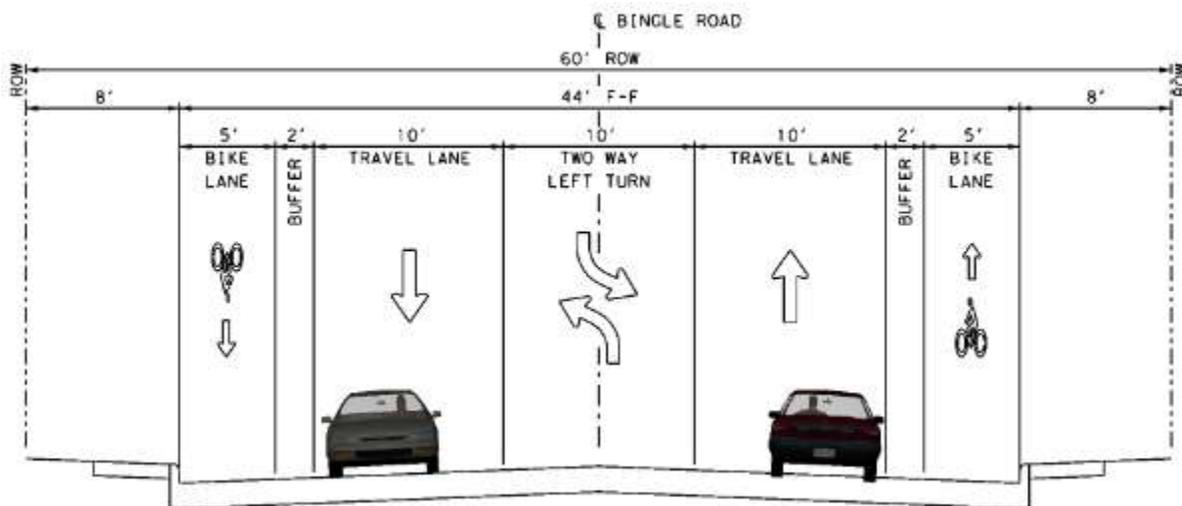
(Option 1) Proposed 3-Lane Section with Bike Lanes (Existing Pavement Width)
